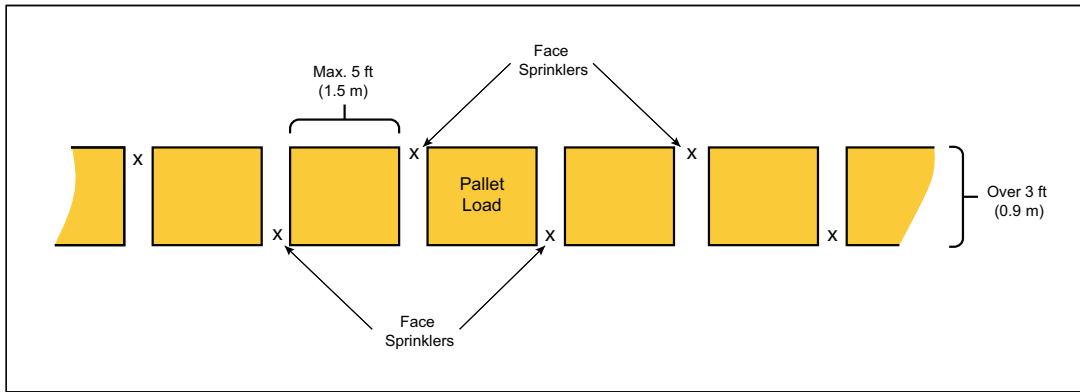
Horizontal in-rack sprinkler arrangement for indicated conditions when single-row racks deeper than 3 ft (0.9 m)
